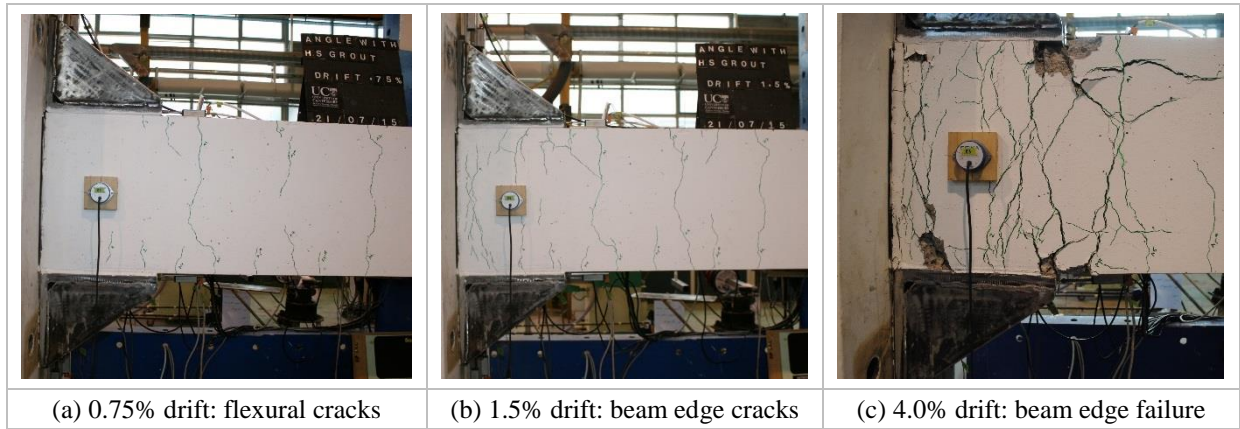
Typical damage states to the beam with angle connection at different drifts (Test-A4)
